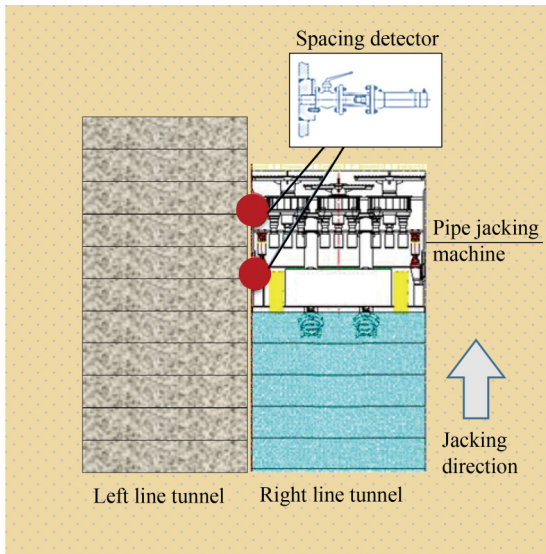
Spacing detection device for close-fit construction of twin rectangular pipe jacking tunnels.
